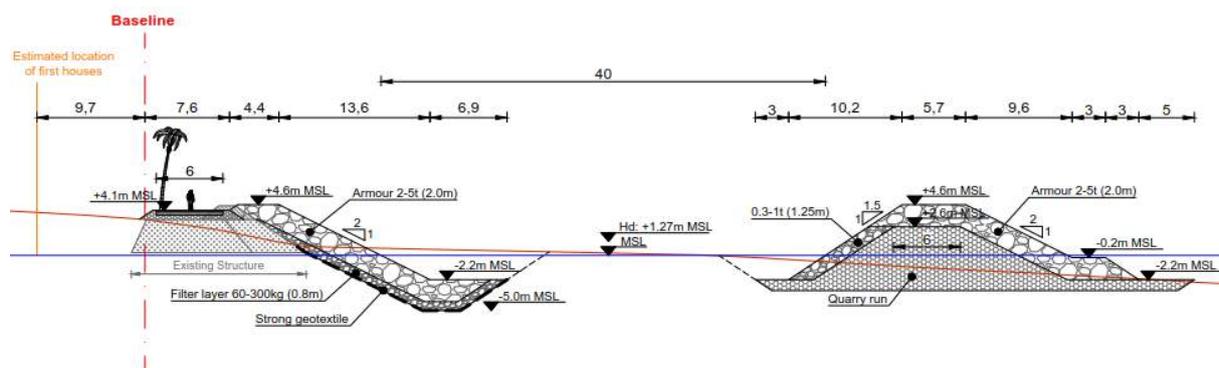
Principle cross-section fishing landing site northern part New Kru Town revetment (at dashed red line in Figure 3-7)
